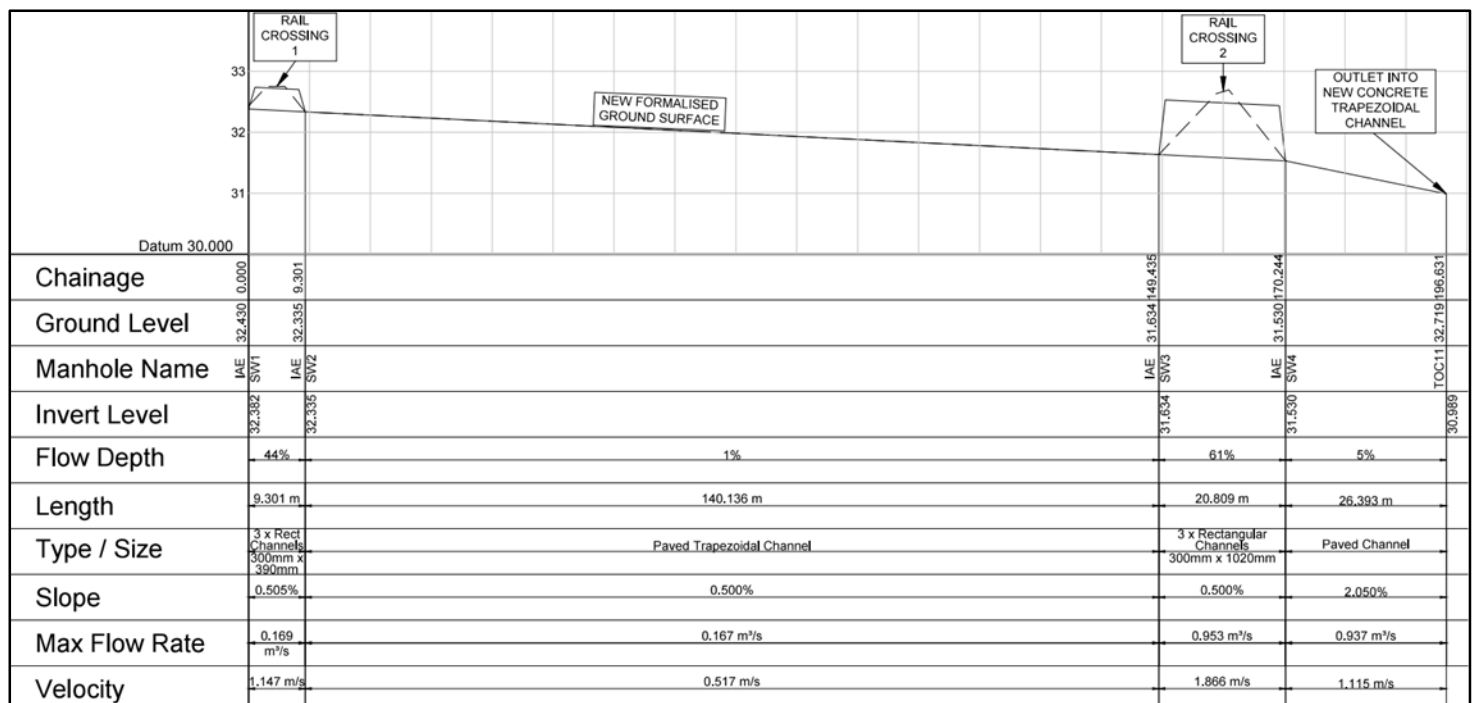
Long section of proposed new stormwater infrastructure between IAE SW1 and TOC11
